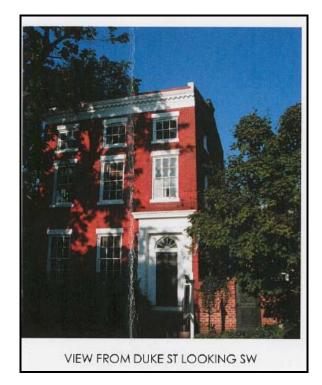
Existing Photos showing Parapet and proposed relocation site for HVAC units
